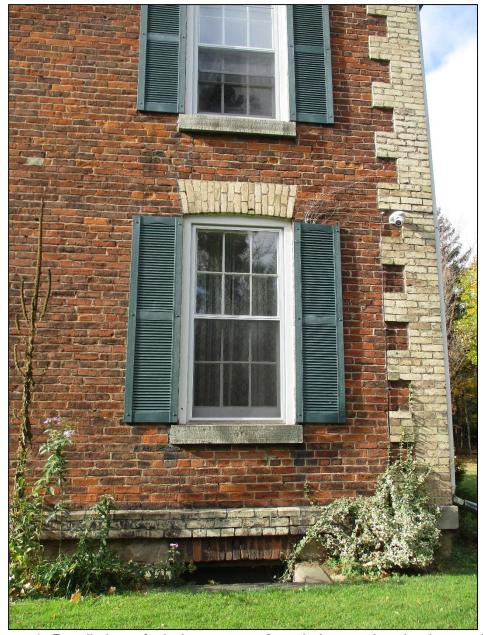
Detail view of windows, stone foundation, and projecting quoins
